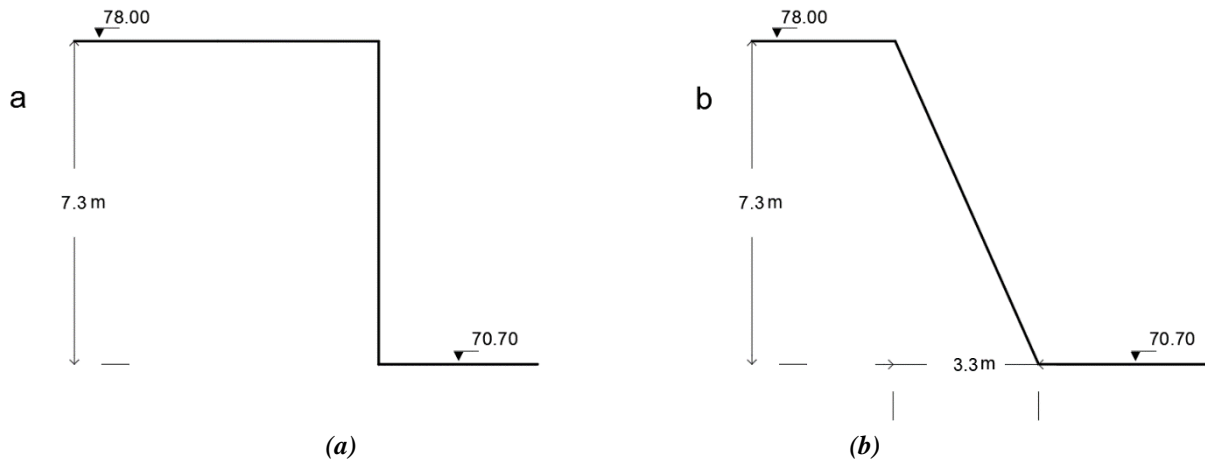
a* and *b* maximum elevation sections to be formed during 1st basement excavation.
